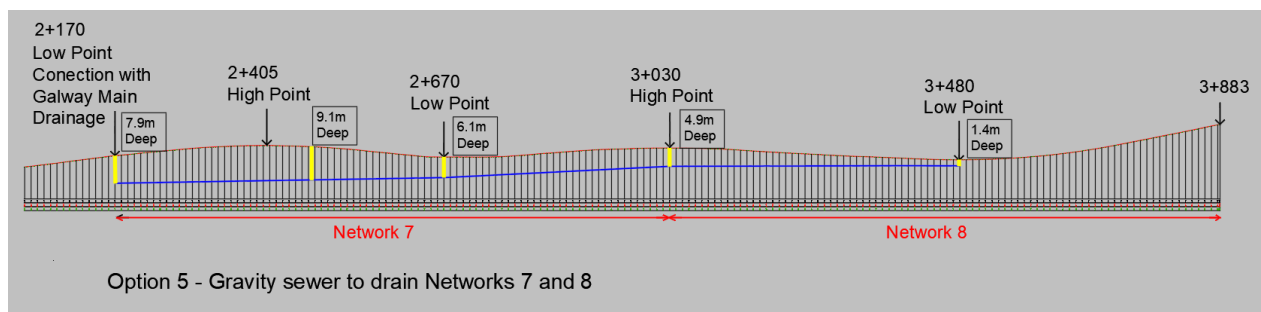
Option 5 – Gravity Surface Water Main Cross Section
